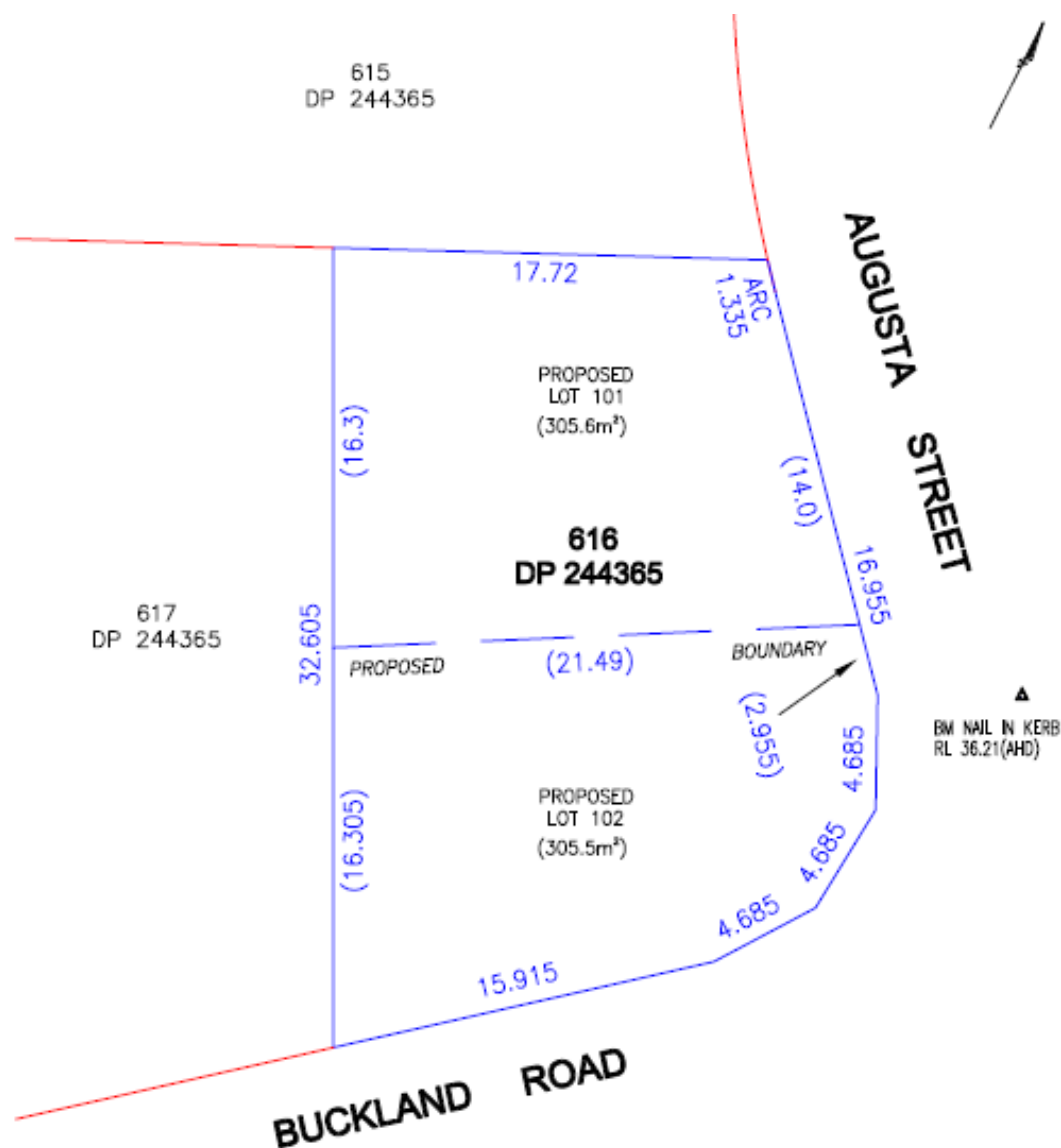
Site location/proposed subdivision plan (RGM Property Surveys)
